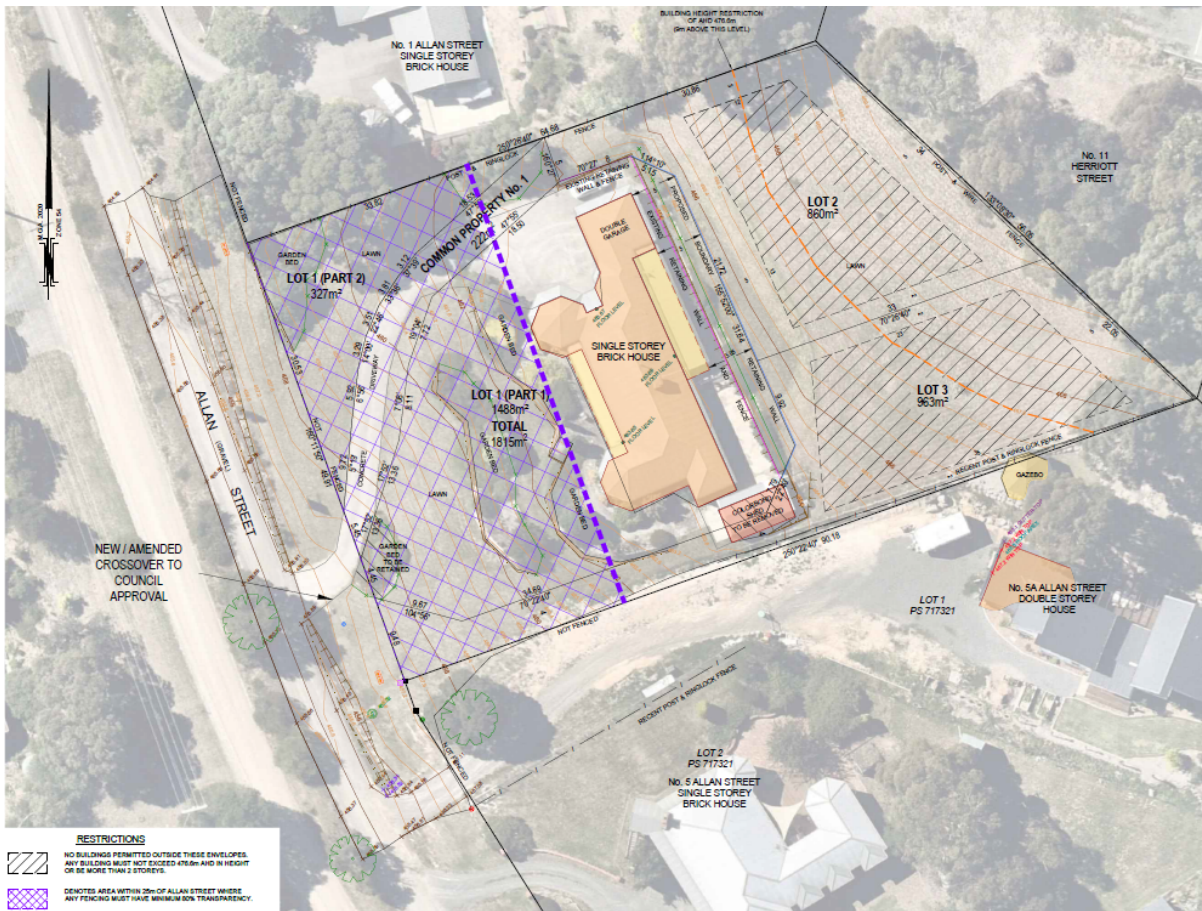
Proposed subdivision with restrictions. Source: Application documents
